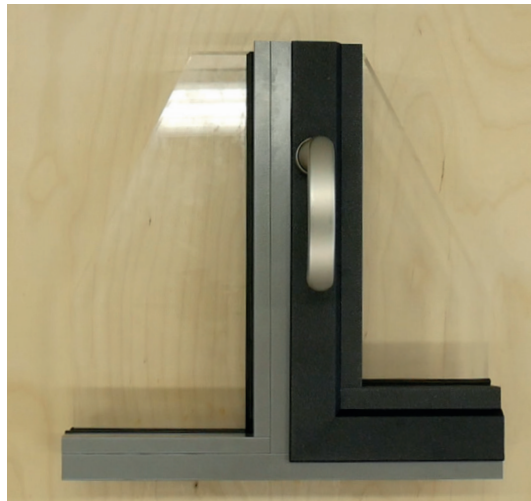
Initial set-up of the RT 72 prototype for disassembly.
